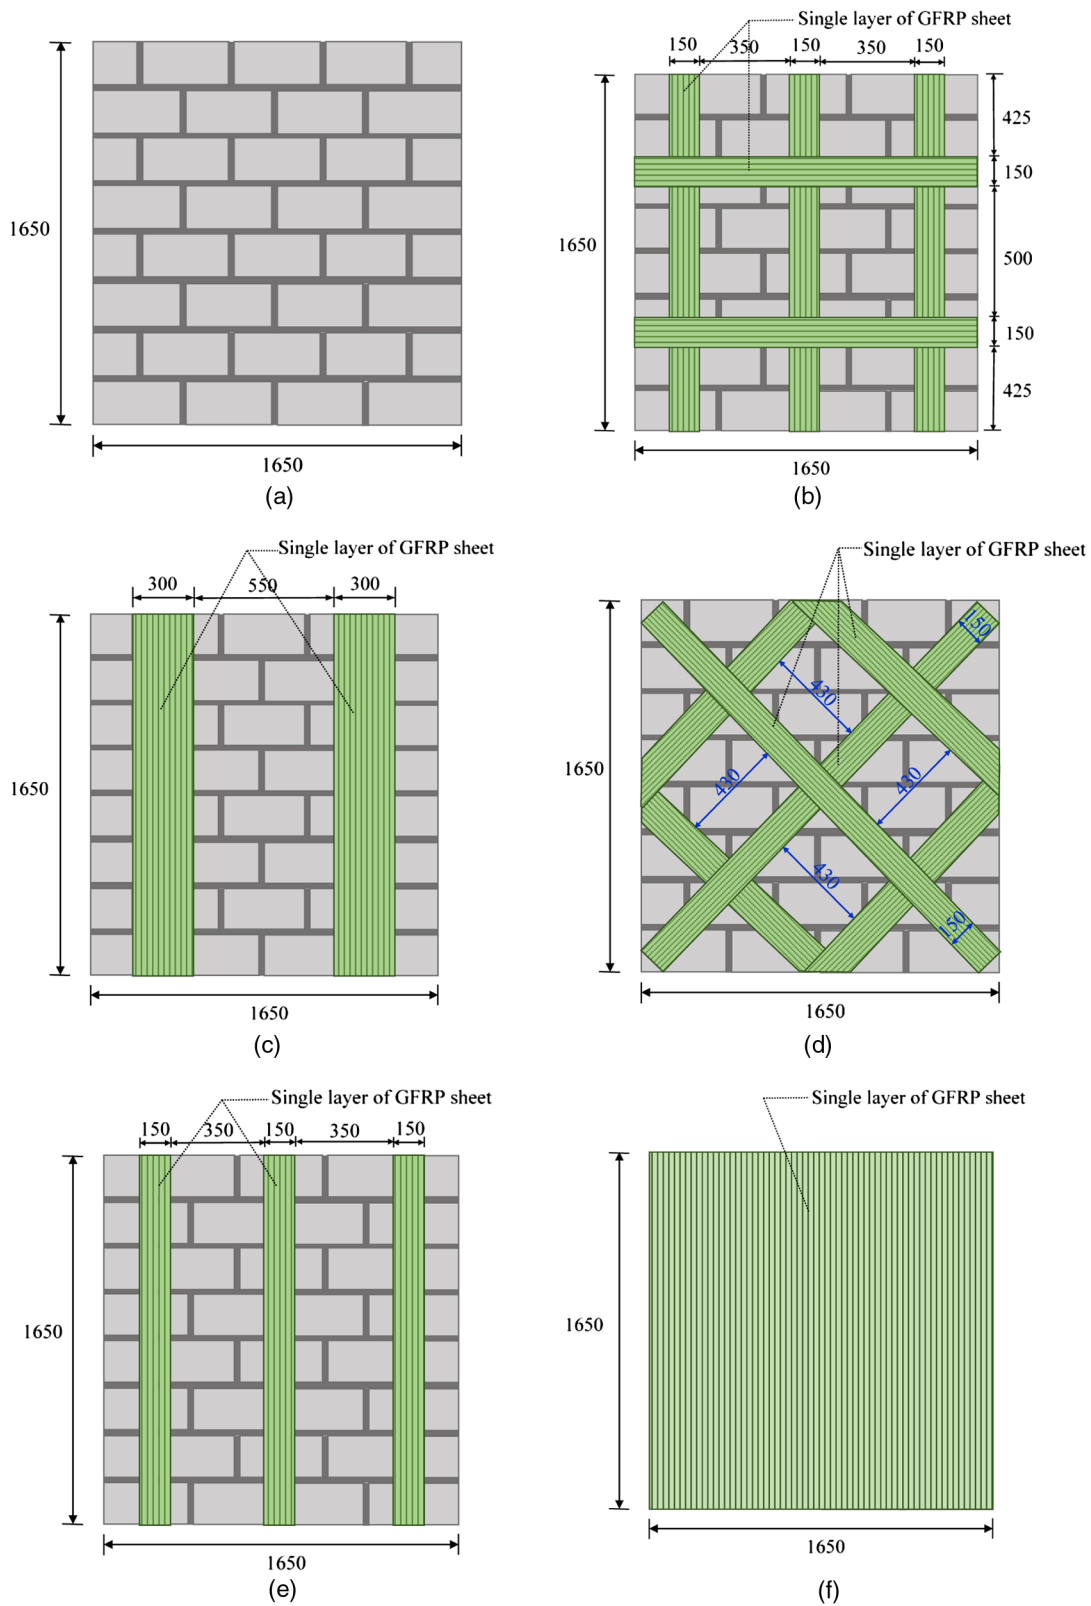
Details of test walls: (a) Wall WC; (b) Wall W1; (c) Wall W2; (d) Wall W3; (e) Wall W4; (f) Wall W5 (note: all dimensions are in mm)
